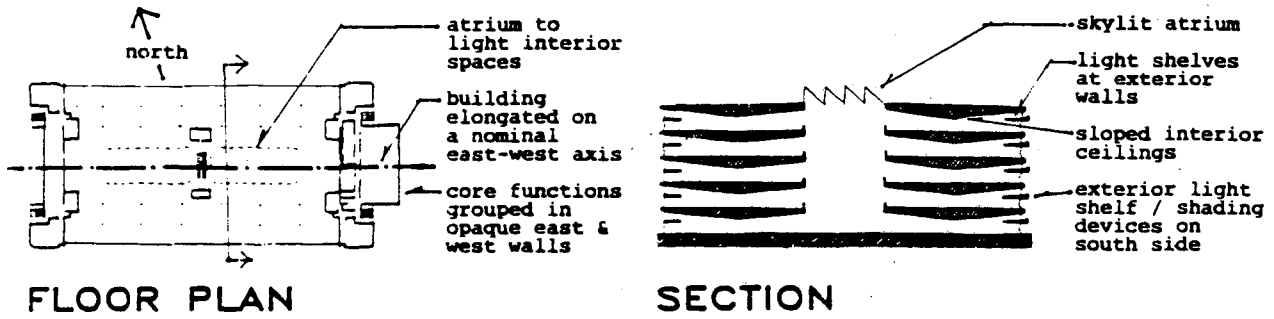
Diagram of building plan and section, showing architectural features of the daylighting system.
